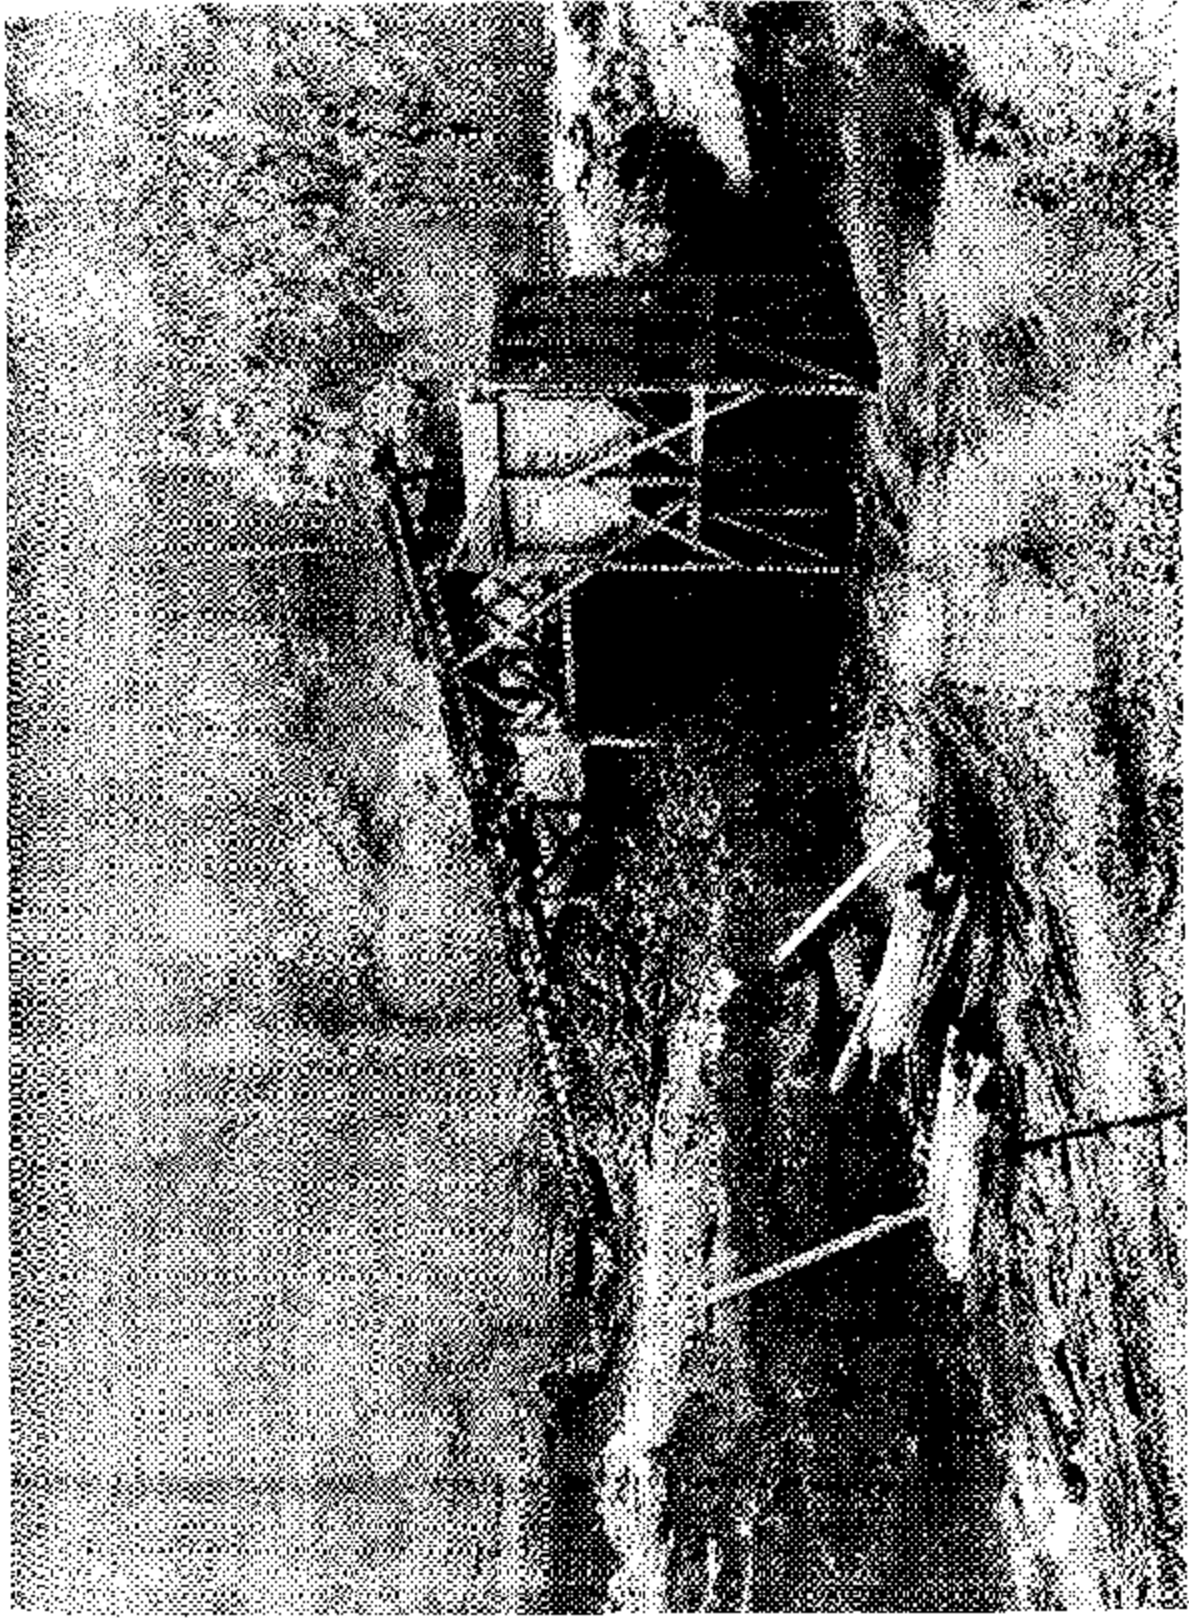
Mine portal with conveyor and loading bin. Fan house at left.
